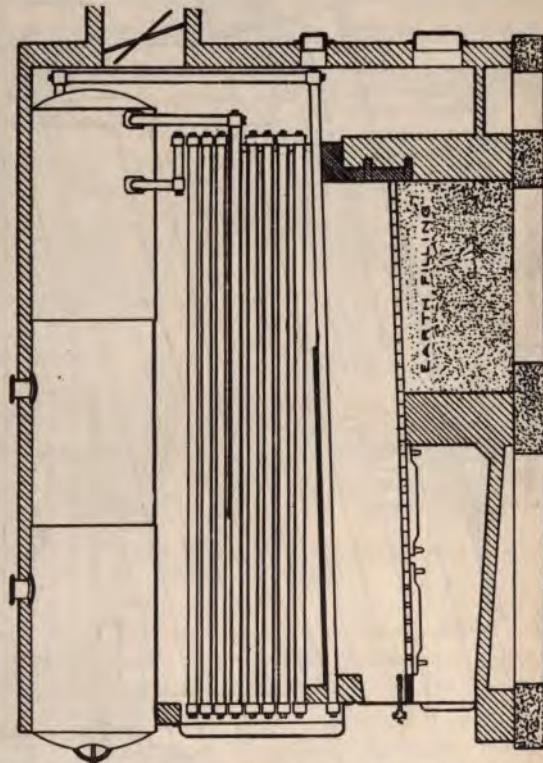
S. & P. Furnace Arrangement Under Parker Boiler.
